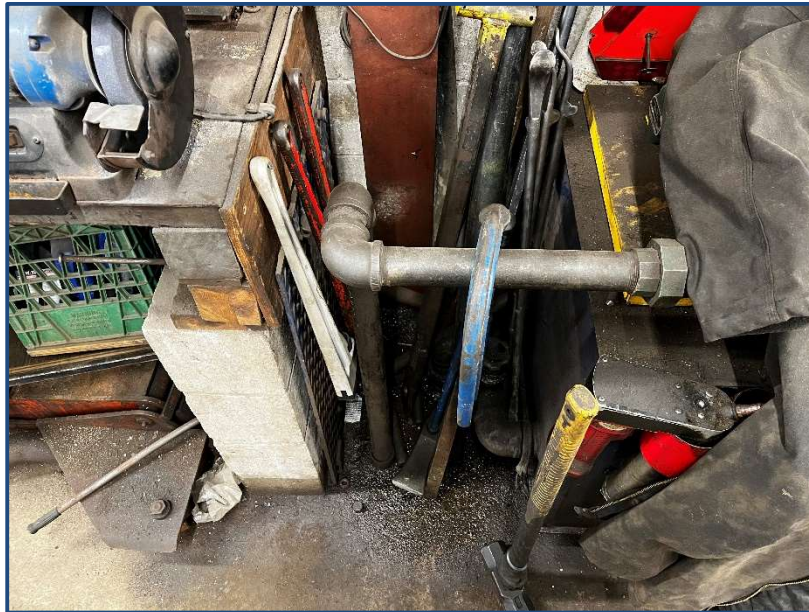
Crack in Concrete Block Half Wall behind Oil Storage Container
